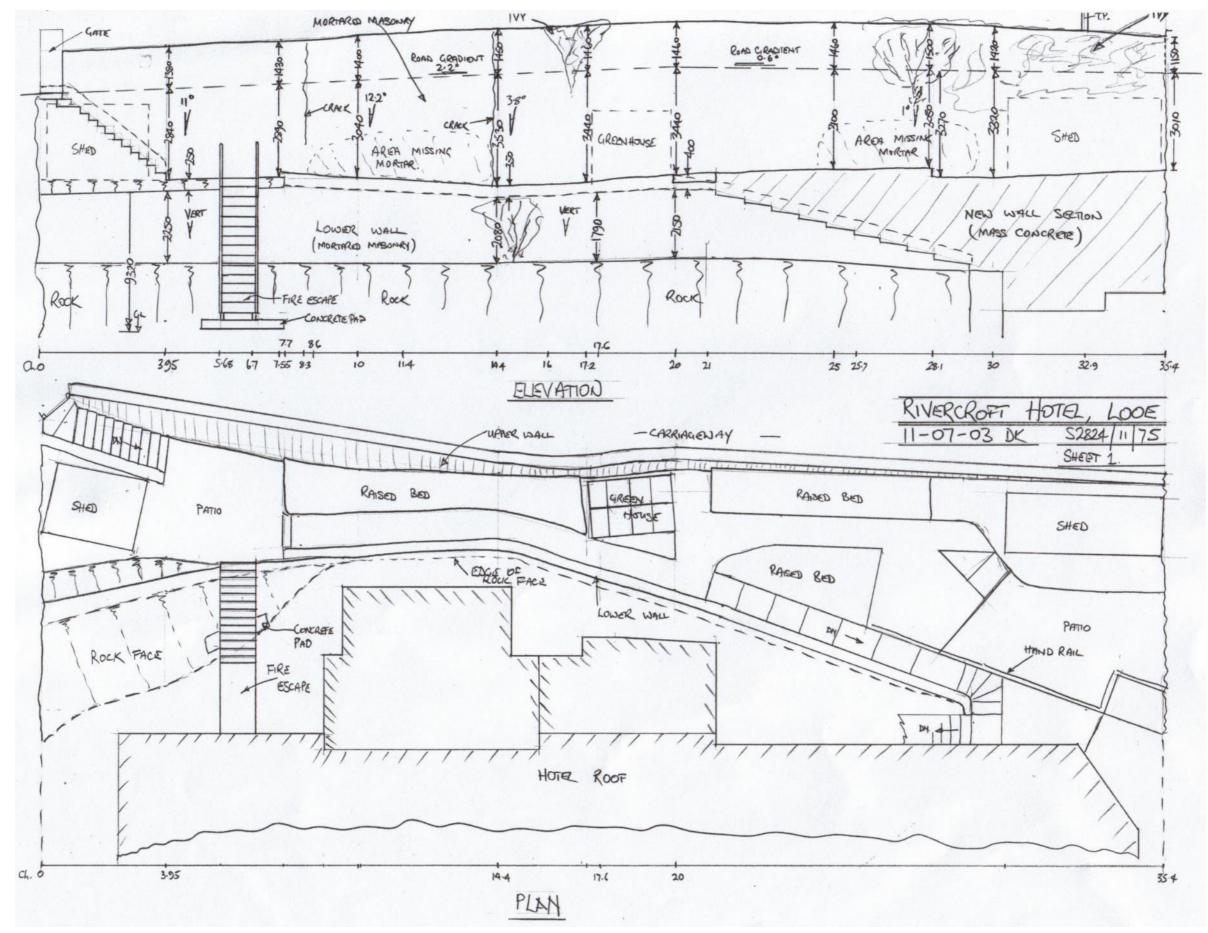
Sections L and M west elevation drawing and plan (2003c).
